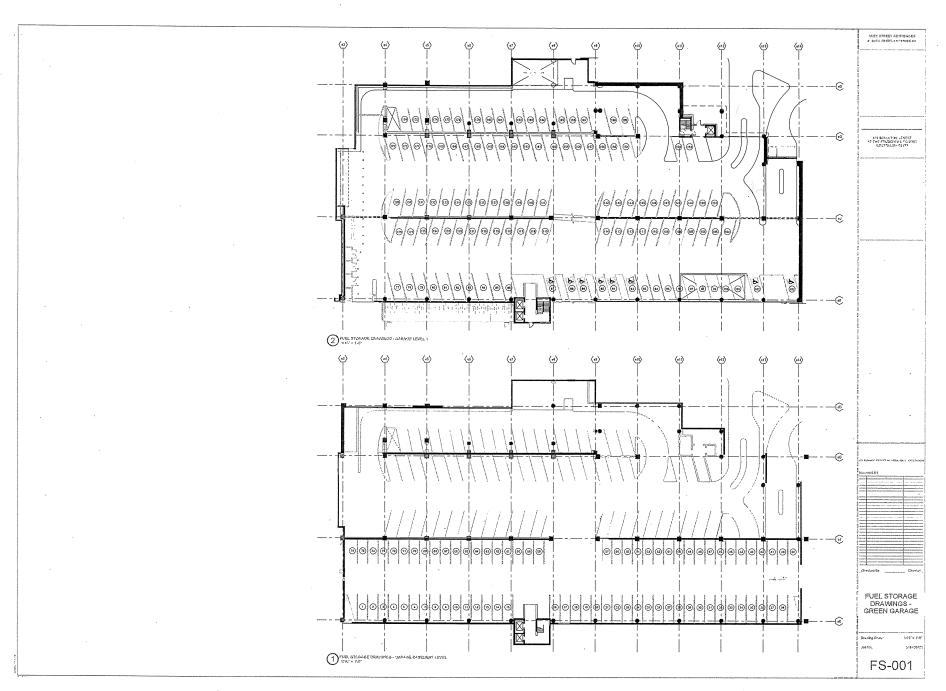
Proposed Layout Green Garage (824 Spaces)
